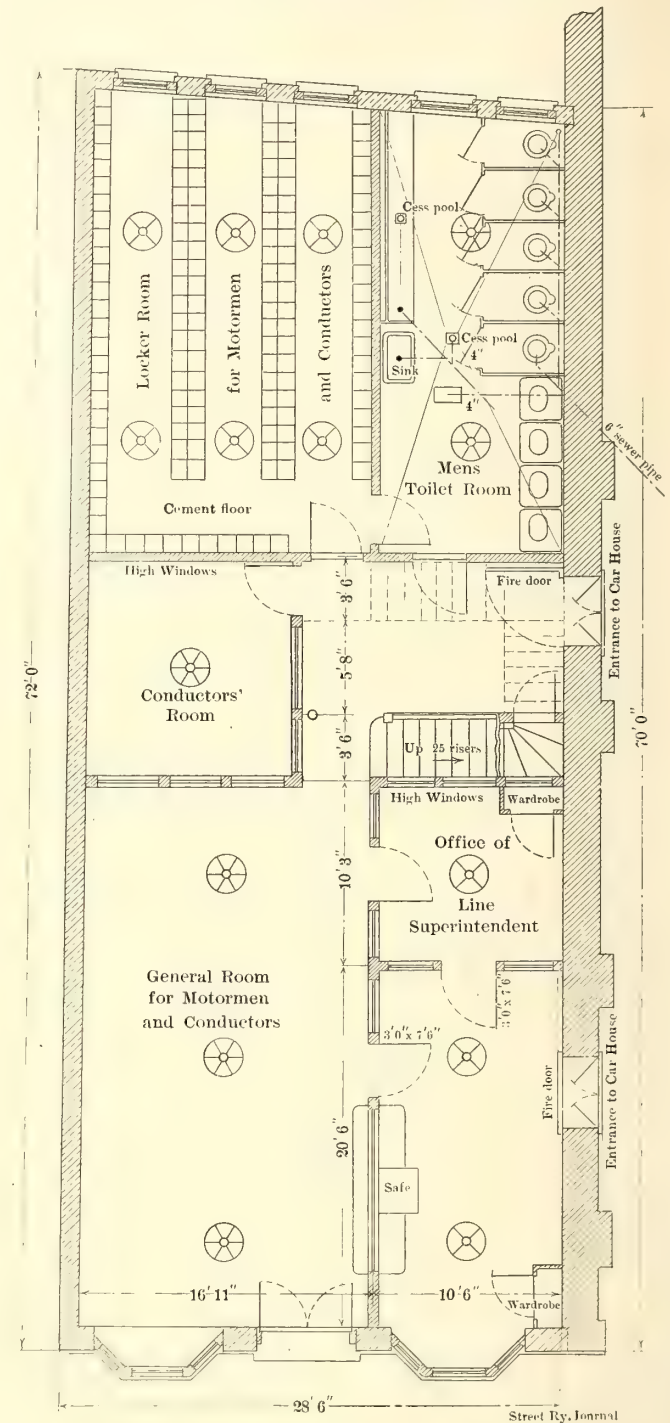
PLAN OF GROUND FLOOR OF SERVICE BUILDING AT LIGHT STREET
